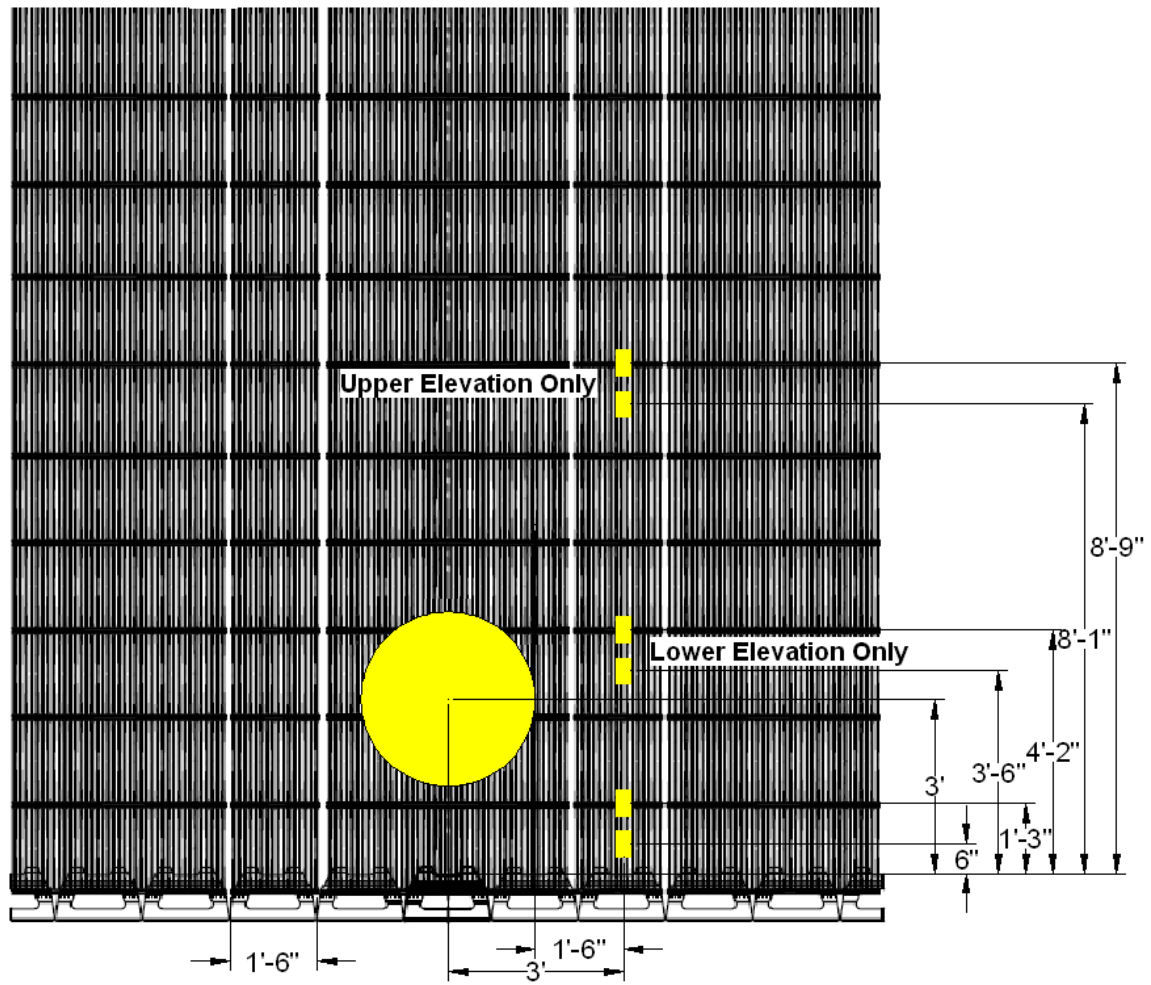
Plan view of strain gage locations for Shaft A. CMD bars are parallel to the wall facing.
